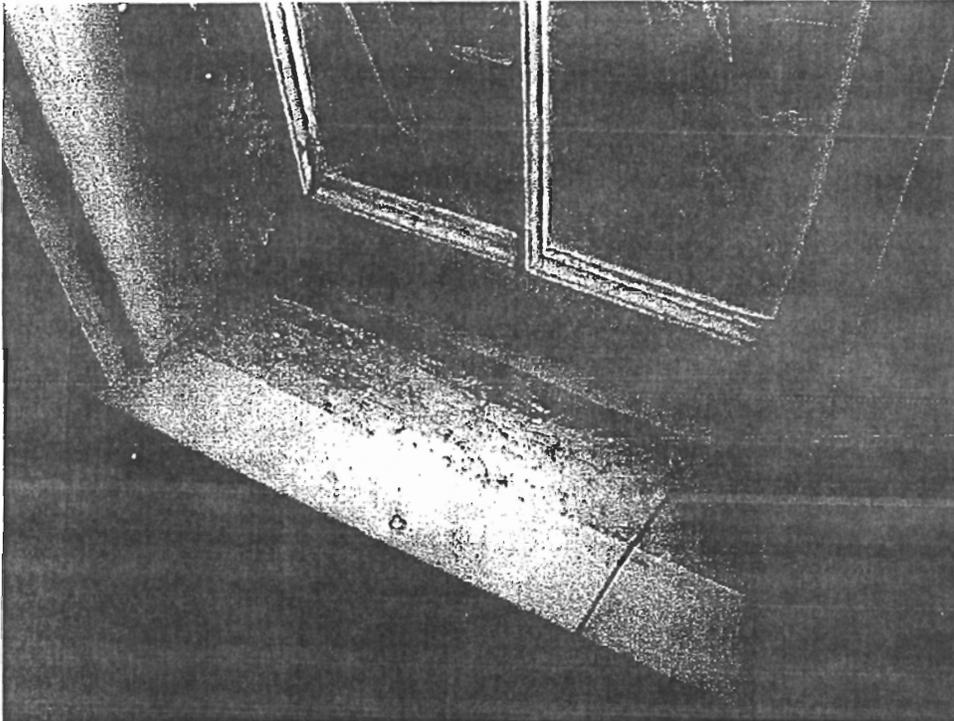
Extensive water damage to window frame at interior main house windows.
